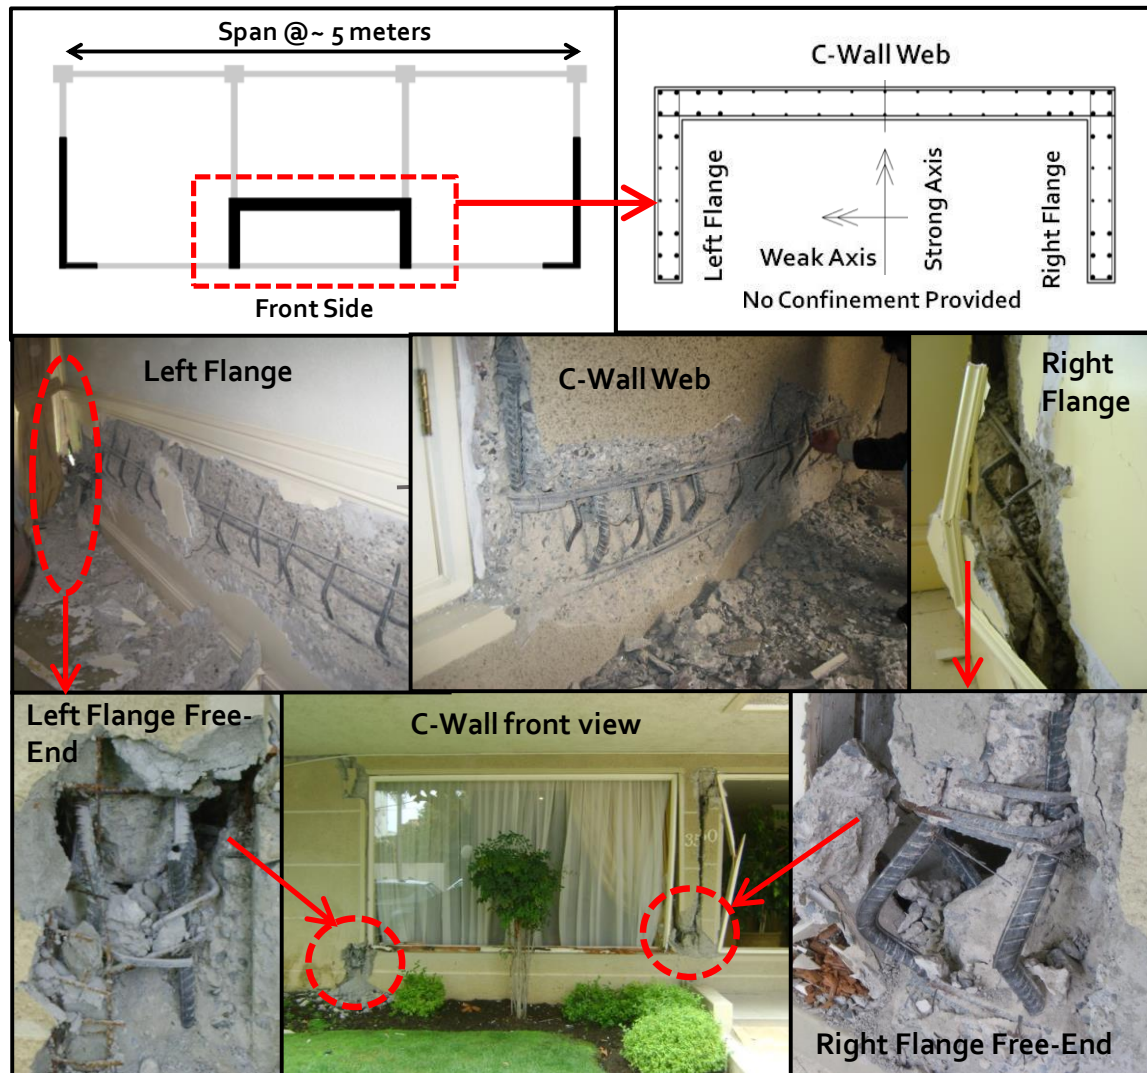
C-shaped wall in Building 6, Viña del Mar 12-storey residential building.
